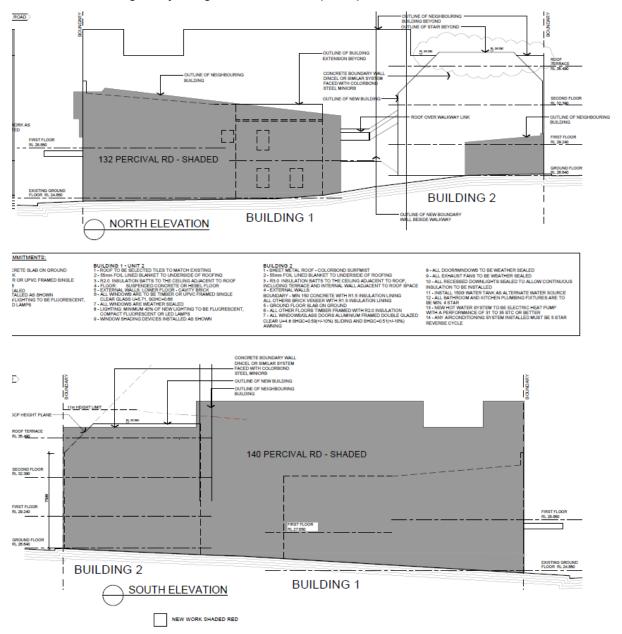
Amended elevation plans indicating the location of the existing building (coloured in grey, building 1) and the proposed three-storey addition (outlined in white, labelled as building 2) facing in a southerly orientation towards no. 140
